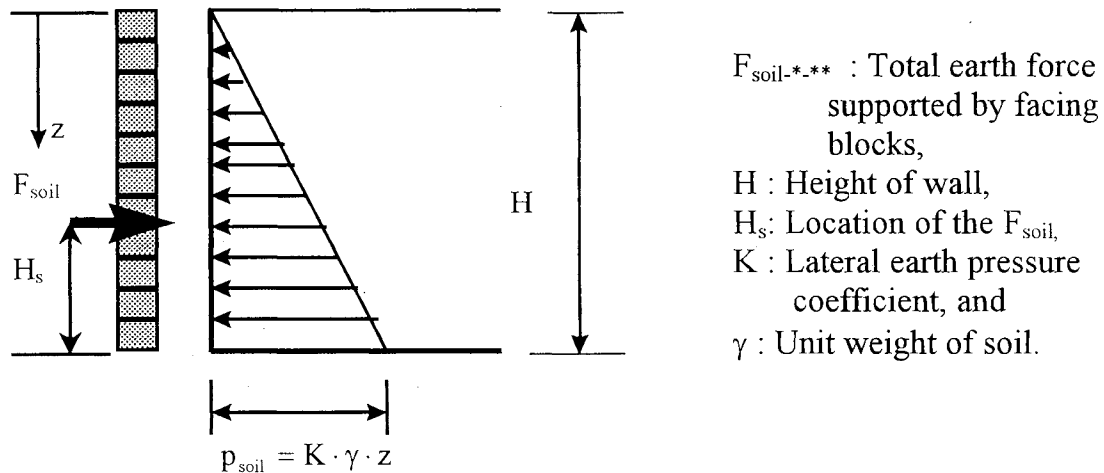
Lateral earth pressure distribution of an unreinforced retaining wall.
